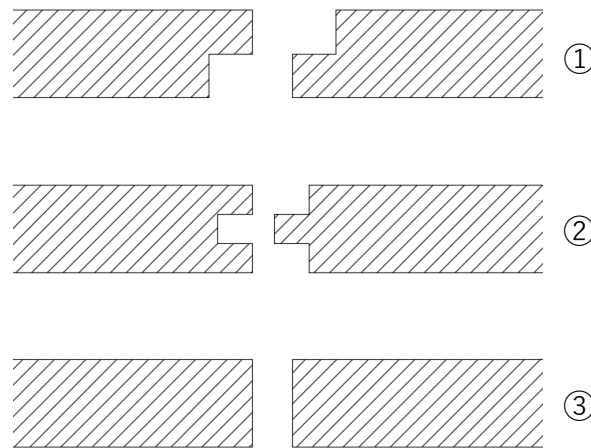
Pavement schematic wood board connections – (1) Half lap joint; (2) Male-Female connection; (3) Top to top connection - Adapted from (Augusto Leitão, 1896)
